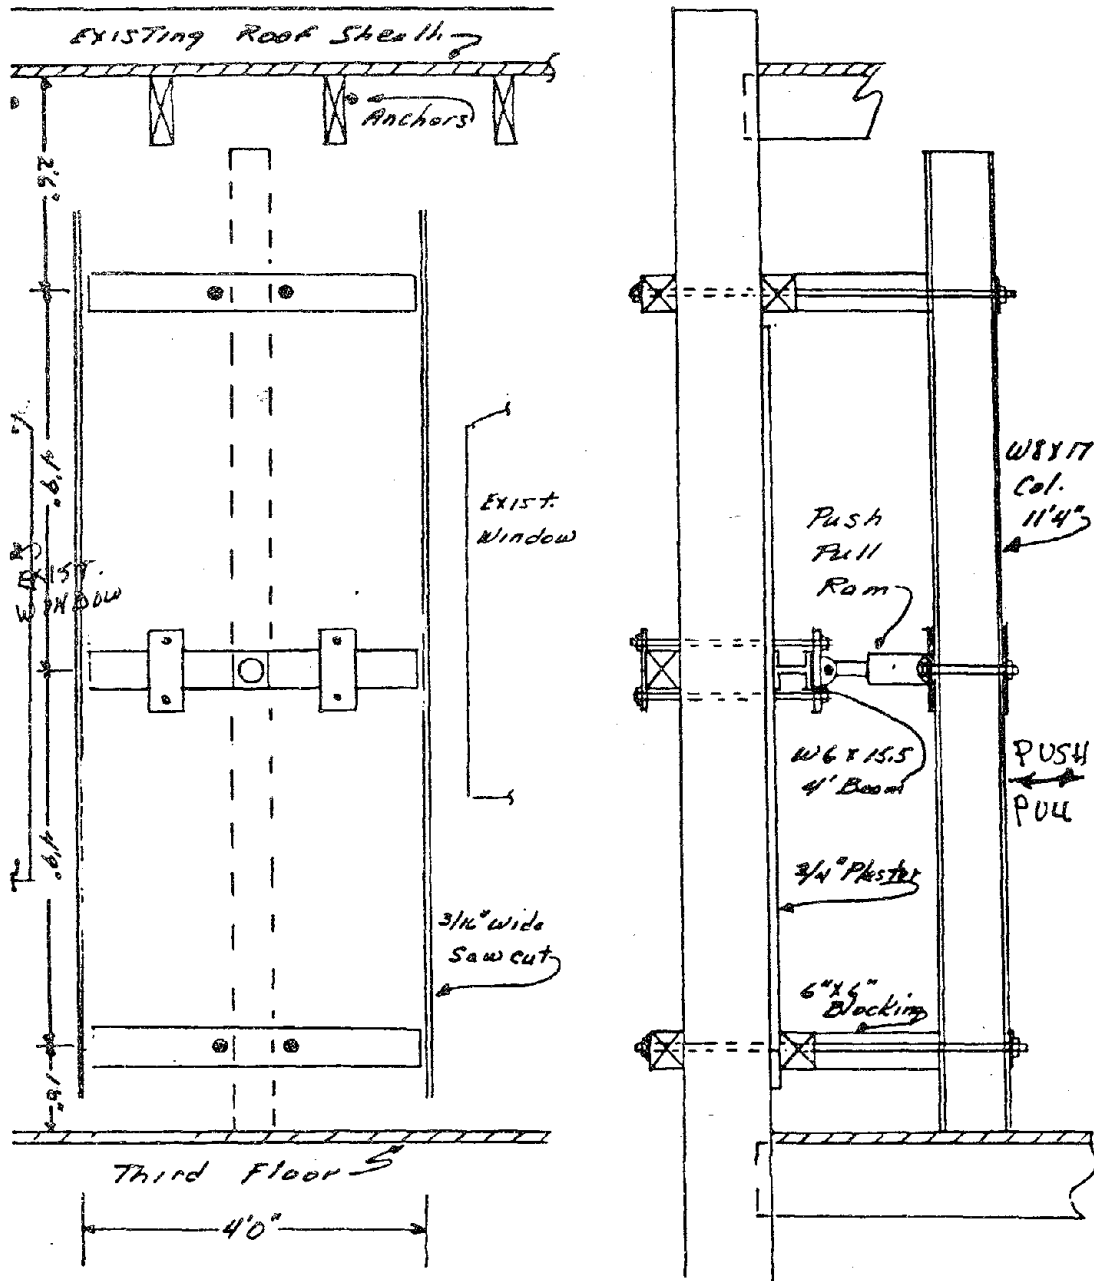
OUT OF PLANE BENDING TEST OF WALL
